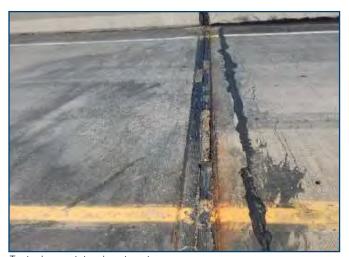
provides a sampling of the photo log developed during the field inspection showing just some of the existing bridge conditions that need to be addressed. Copies of the previous inspection reports as well as the photo log of the field inspection can be provided if requested.
